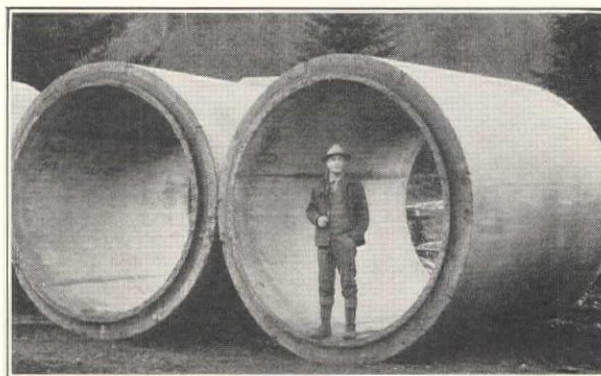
Completed Sections of 96-in. Diam. Reinforced Concrete Pipe for Lake Youngs Aqueduct
